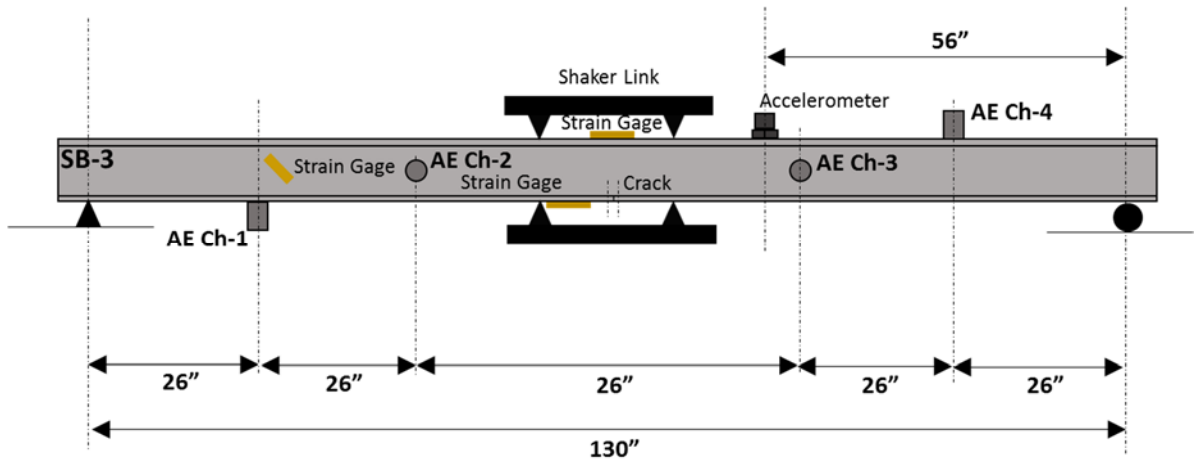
Locations of gages, transducers, accelerometer and crack in beam SB-3.
